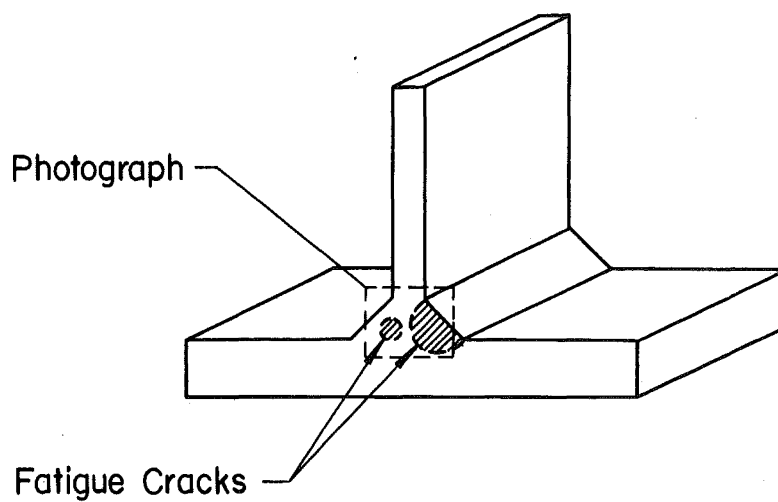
Two small fatigue cracks that initiated from pores in the longitudinal fillet-weld and grew perpendicular to the axis of the weld ($\sim x8.5$)
